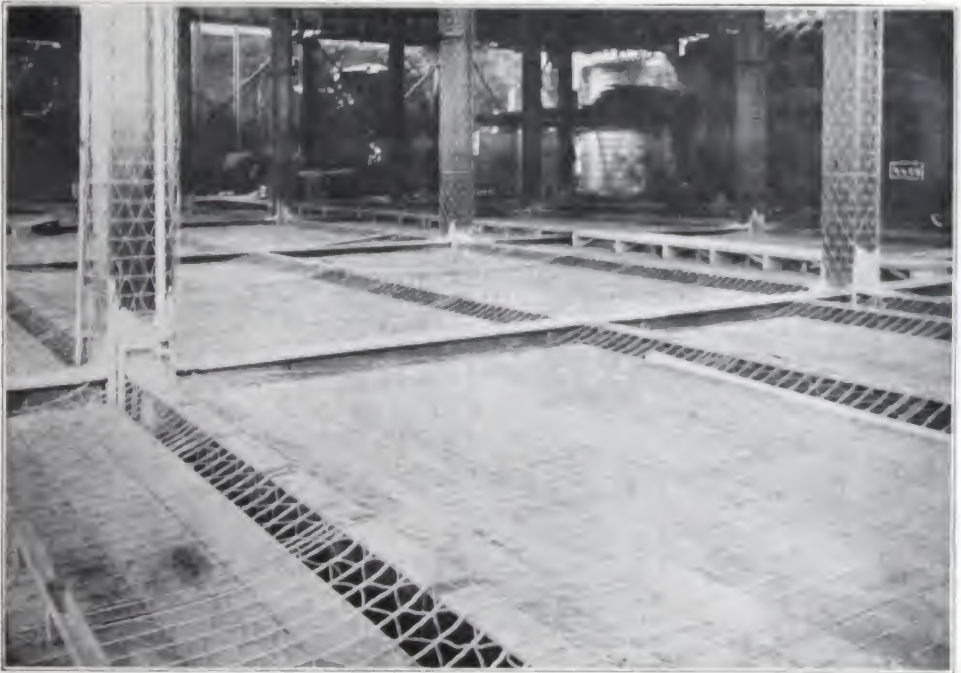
Ballargeon Building, Seattle, Wash. Steel framing fireproofed and floor slabs reinforced with Triangle Mesh Reinforcement.
